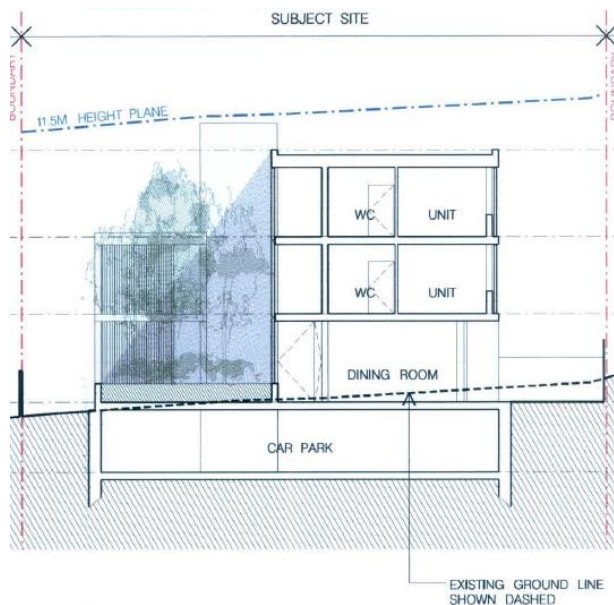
Cross section of the building illustrating the existing ground level and proposed cut along the northern section of the building.
